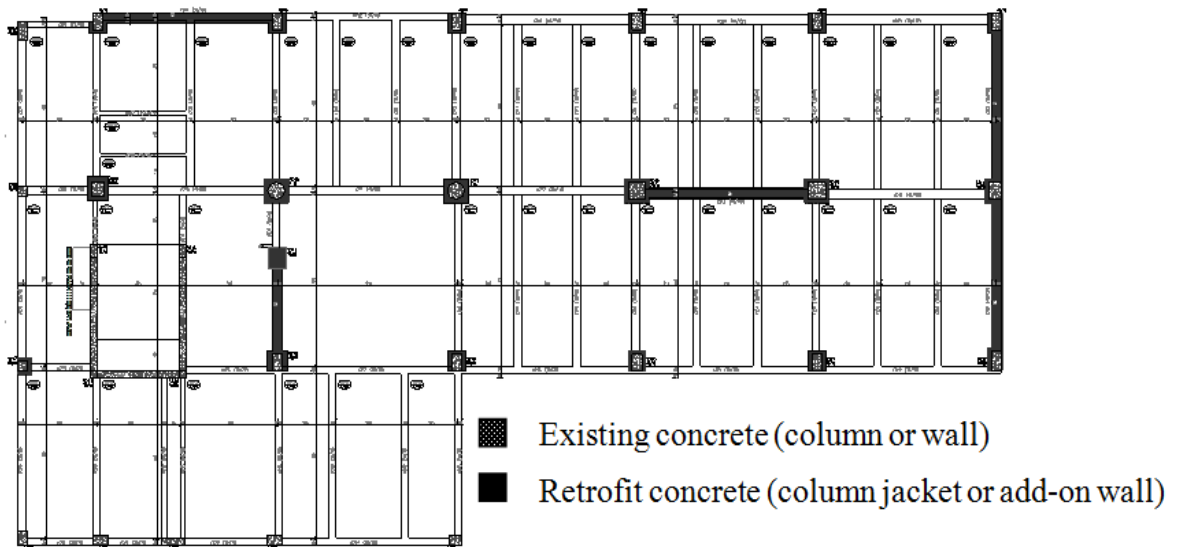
Location of Jacketed Columns and Added Structural Walls on Floor Plan.
